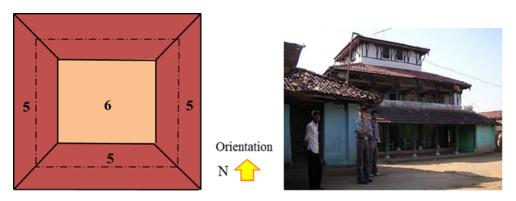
Nandyavarta (5 – Main Building, 6 – Court, 9 – Walkway)
